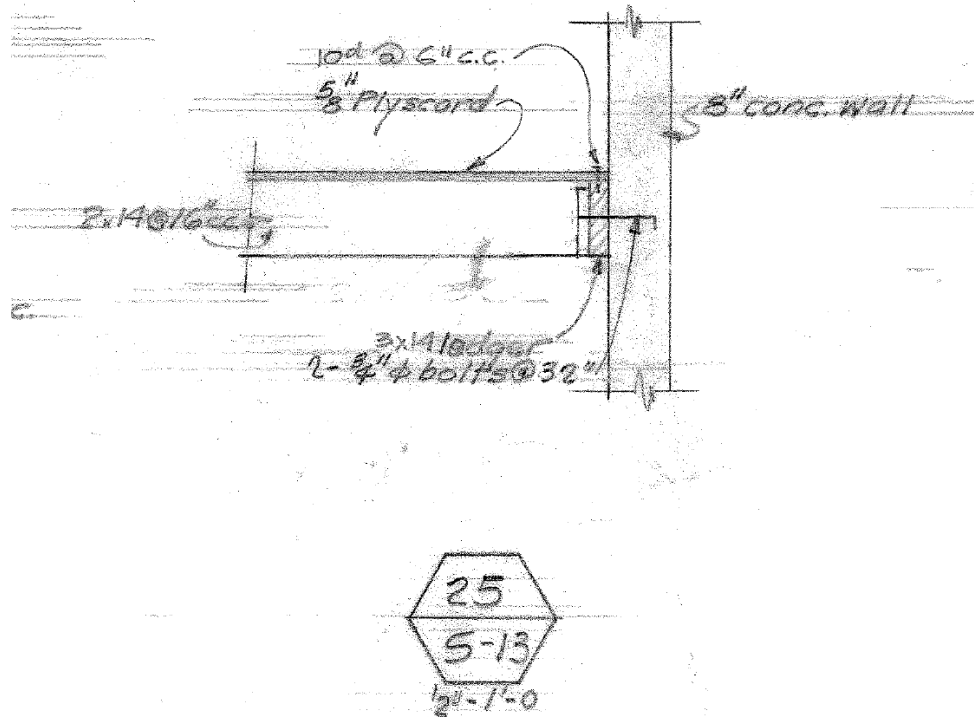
Second Floor Diaphragm to Concrete Wall Detail 25/S13
